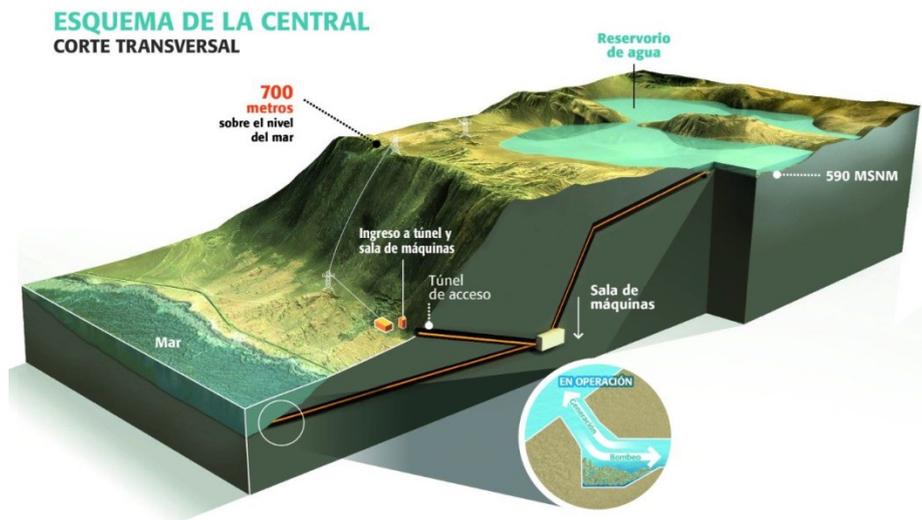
A 300 MW sea water pumped storage hydropower plan in Chile (ref. 13)
